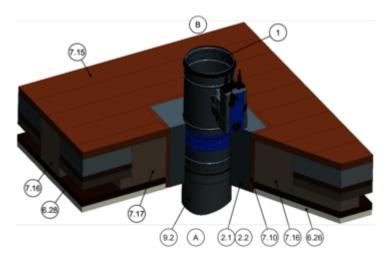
Mortar-based installation into historical wooden beam ceilings
